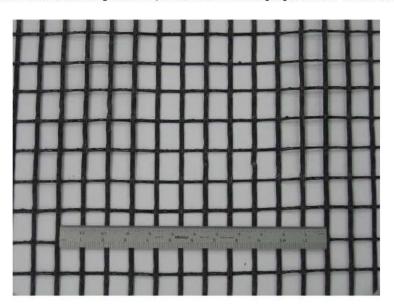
Photo of Miragrid 7XT (machine direction is perpendicular to ruler shown).
